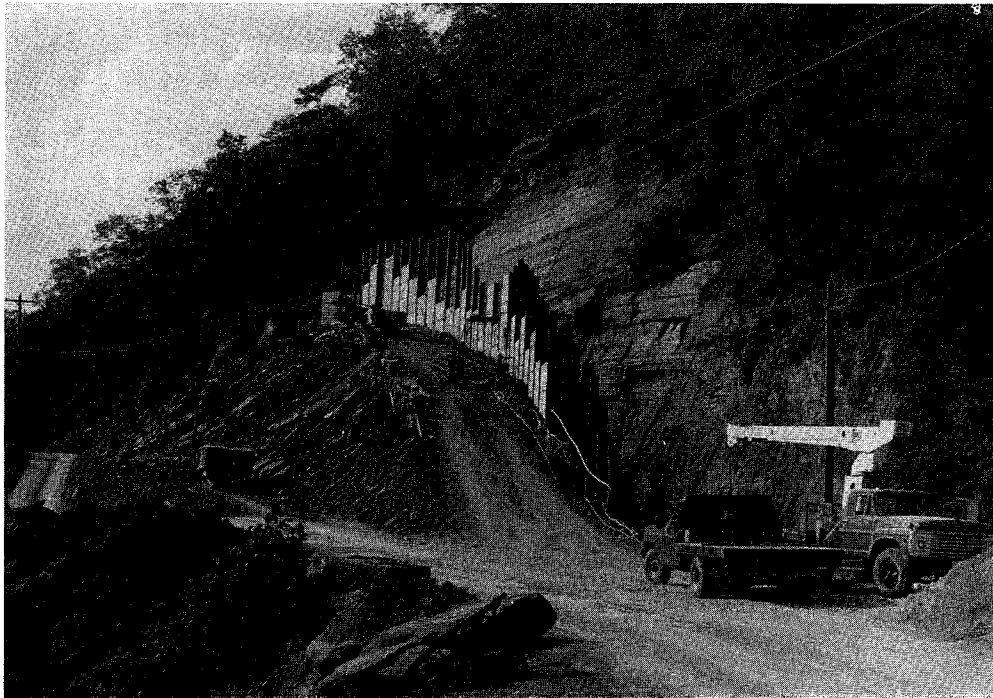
Photograph of partially completed tied-back wall being constructed while maintaining traffic on County Road.
